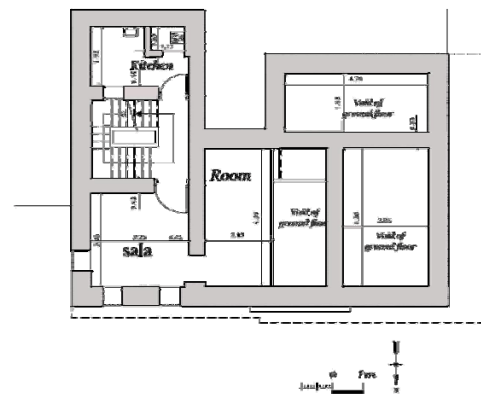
Bayt Al-Sitt 'Awaṭif: Mezzanine floor plan
